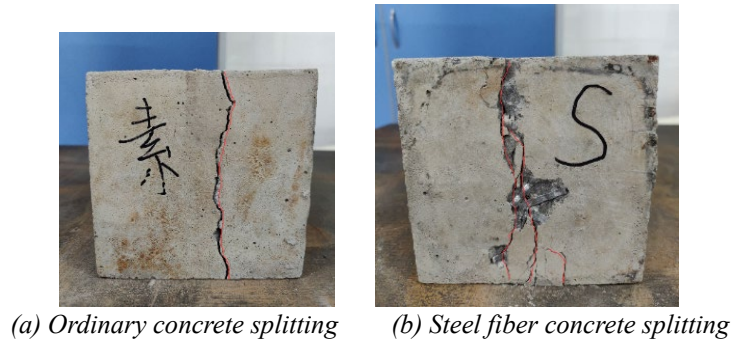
Schematic diagram of splitting and tensile damage patterns of plain concrete and milled steel fiber concrete specimens
